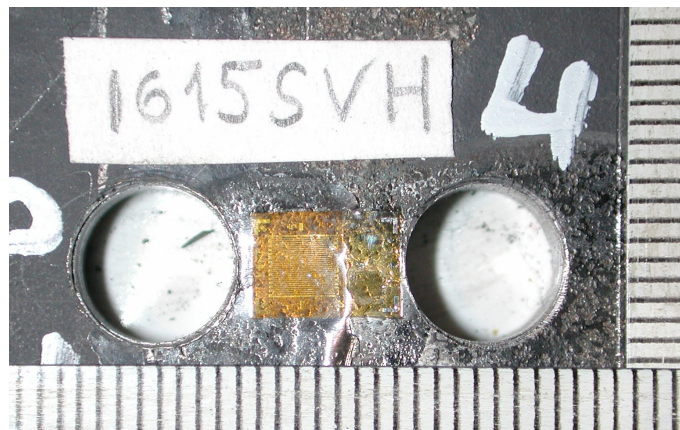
Single strain gauge and through holes in the flange of a plate girder.
